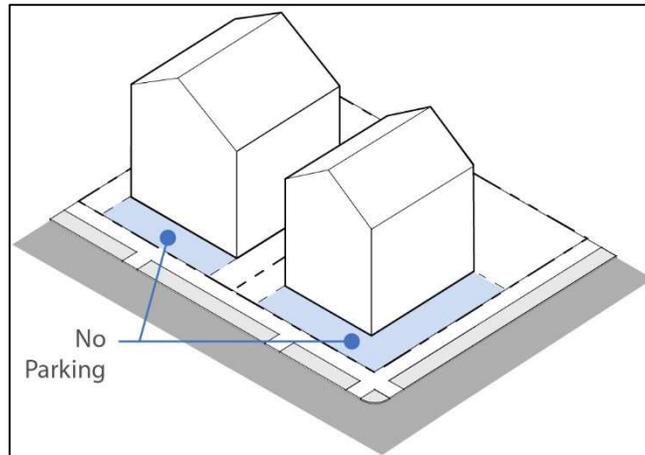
FAÇADE ORIENTATION AND CORNER LOT BUILDING PLACEMENT
